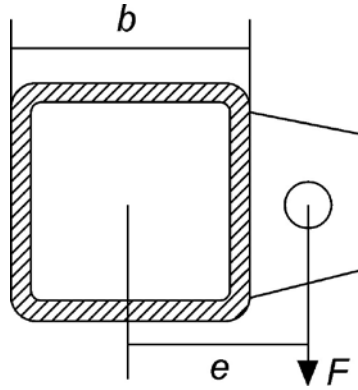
Alternative ways to prevent distortion of cross-section.
